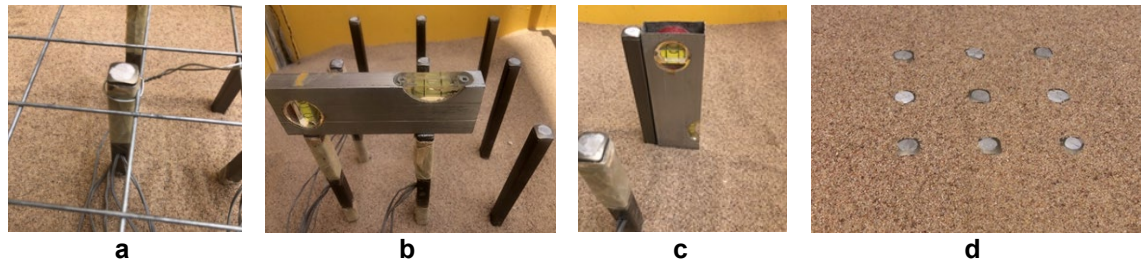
a) Piles fixation by steel mesh, and b) horizontal leveling of upper head of piles, c) vertical leveling of piles, and d) final level of soil and unconnected piles.
